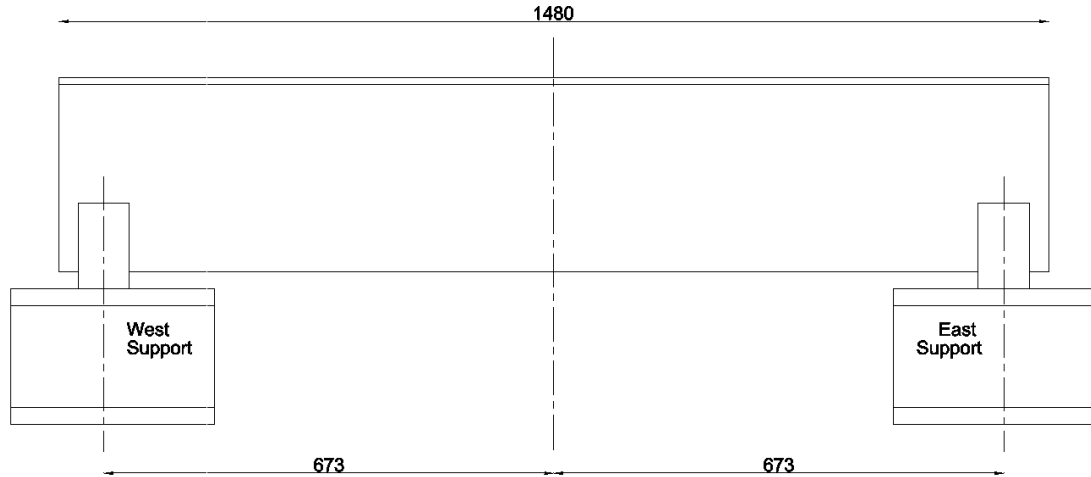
Test layout for type C specimens (all dimensions in mm).
